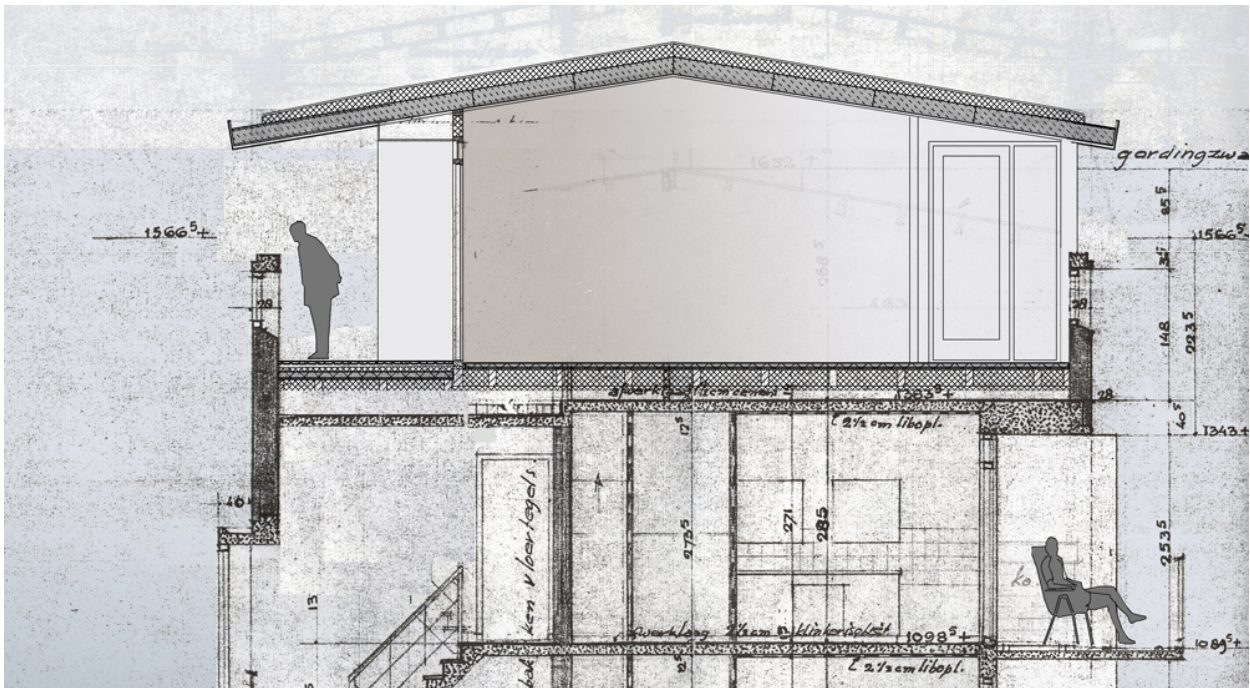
On-top dwelling, (Source: Van Schagen Architecten)
